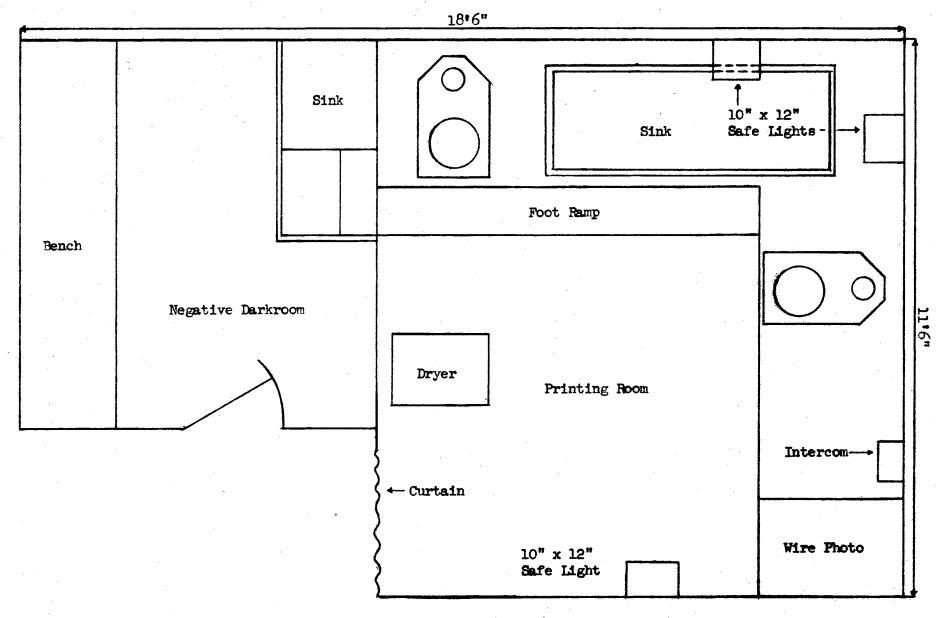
DARKROOM FLOOR PLAN - LAWTON CONSTITUTION. (SCALE 1/2" = 1')
